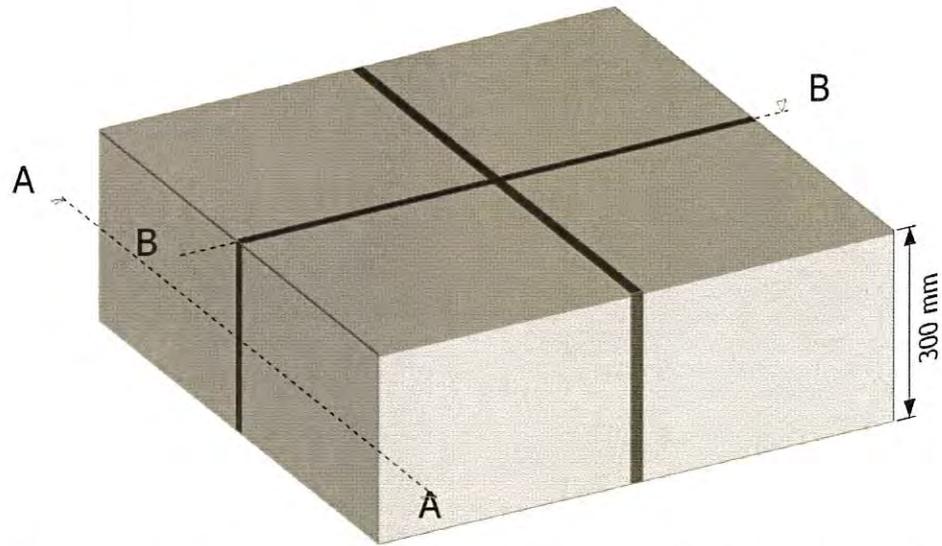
"Alucopanel® A1" 4 mm thick Aluminium Composite Panel Exterior Roof Covering Assembly
